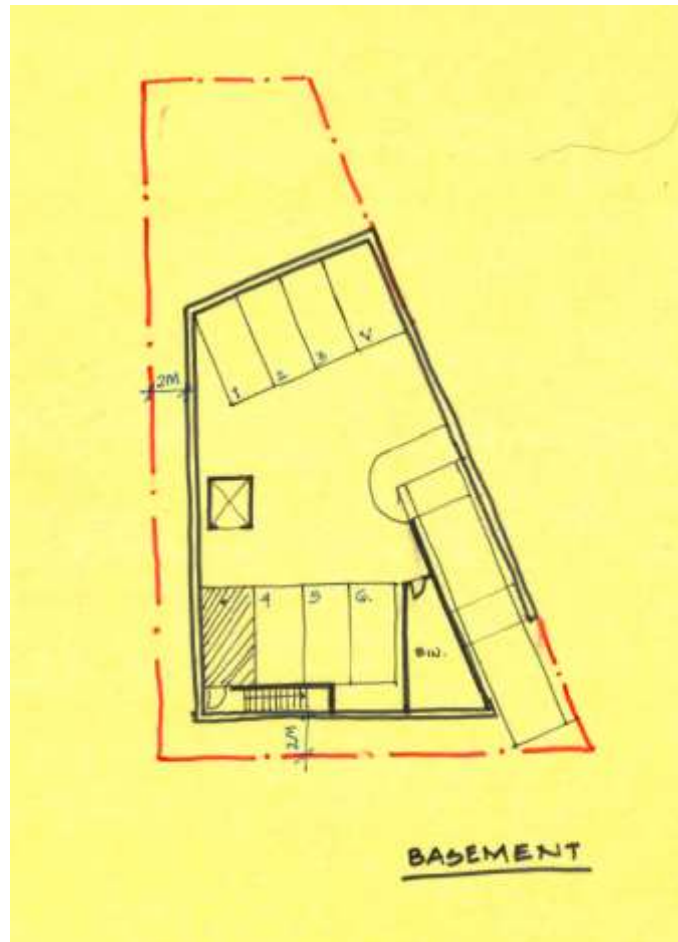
Image indicative basement layout of 42 Gover Street, Peakhurst
